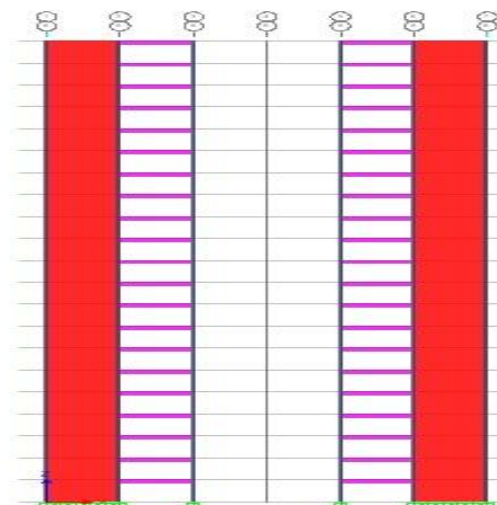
Elevation of G+20 storeys RC and Steel-concrete composite building
